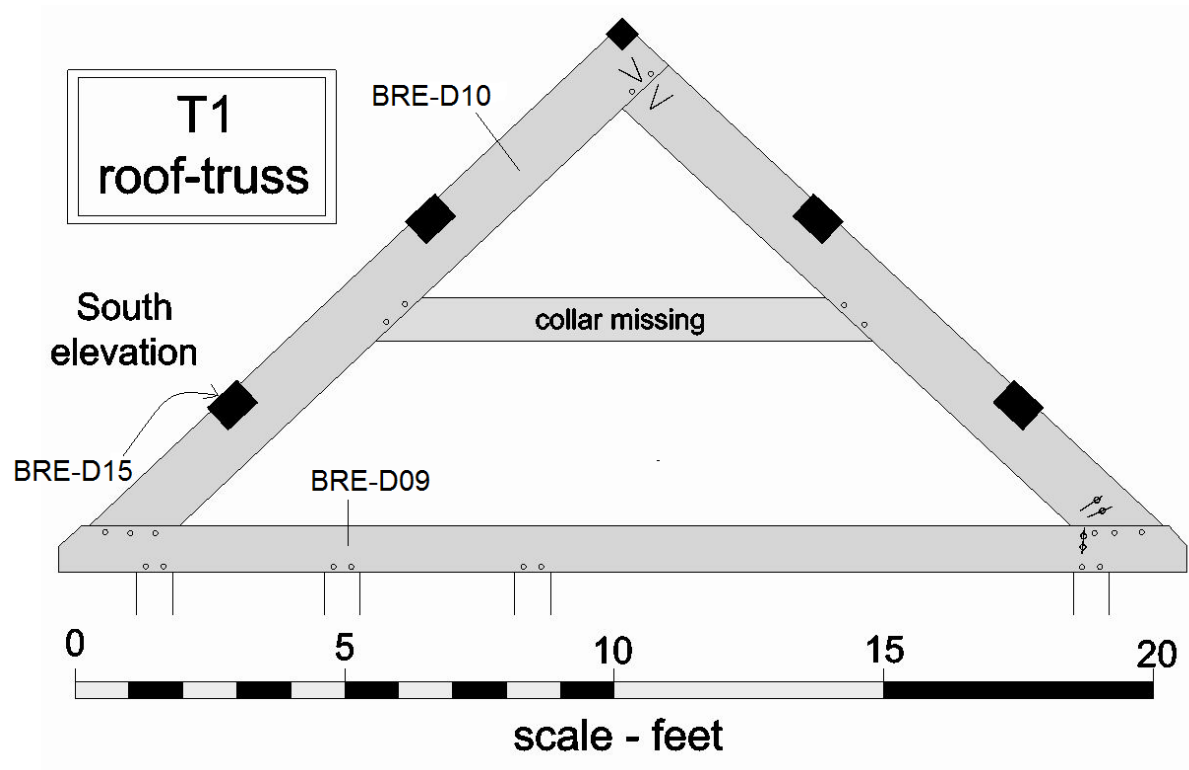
Truss 1, showing the location of samples BRE-D09, BRE-D10, and BRE-D15 (Duncan James)
